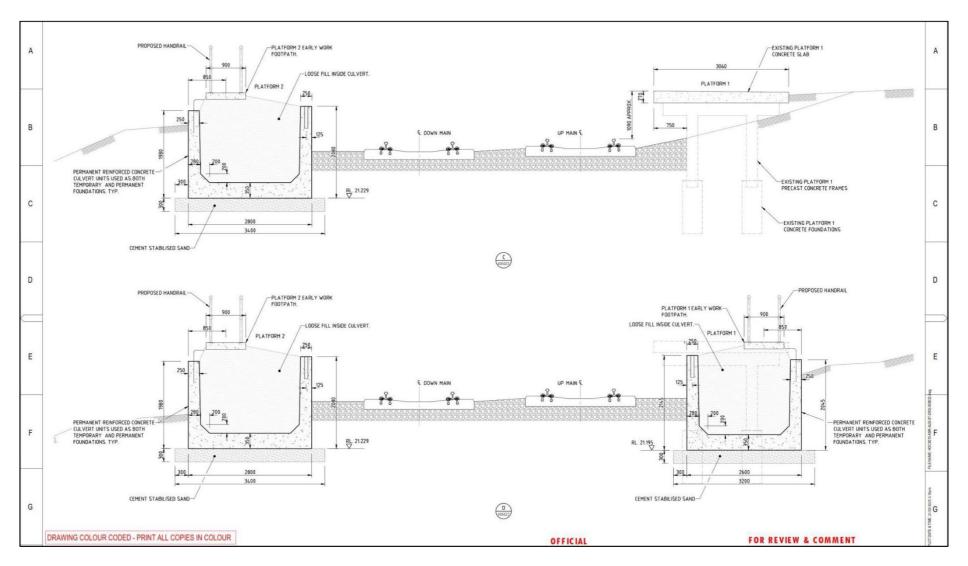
Section plan of the proposed Austinmer Station early works platform extensions (Source: Transport for Tomorrow 2025)
